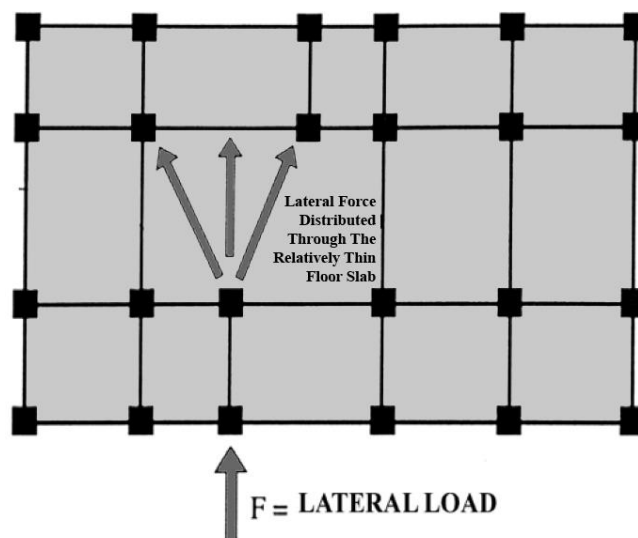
Non-Continuous Beam in a Floor Plan (Ozmen and Unay, 2007)
